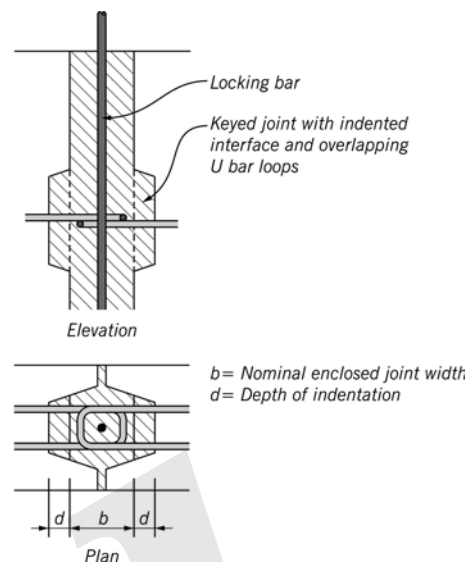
Elevation and plan on profiled vertical keyed joint with overlapping projecting U bars.
